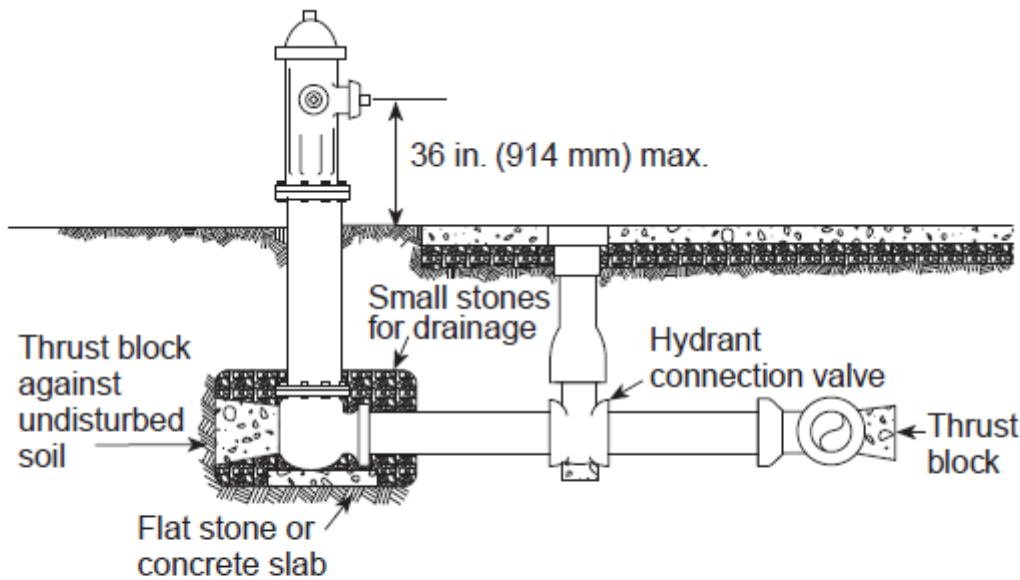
(b) Typical Hydrant Connection with Maximum Height Requirement.
